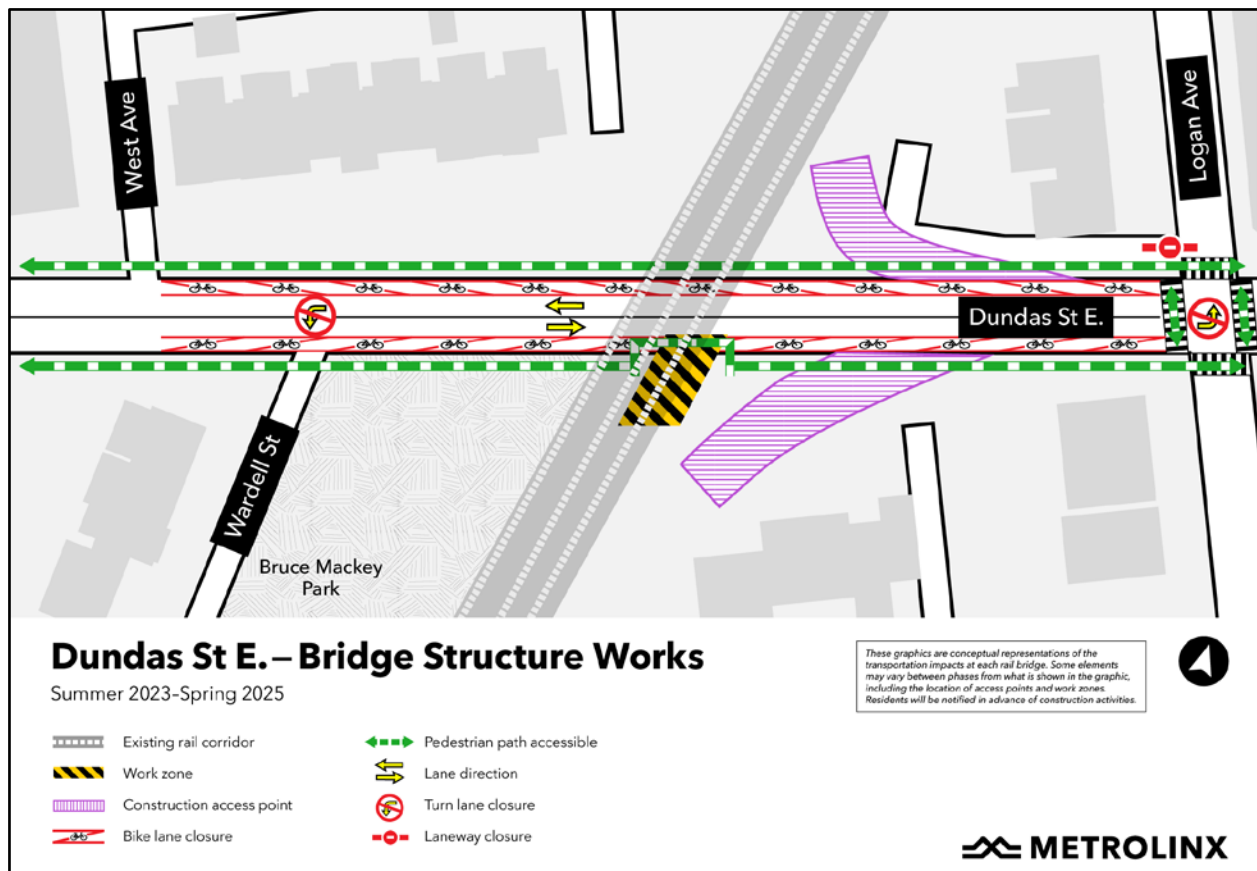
Dundas Street Traffic Management during Bridge Abutment Works
